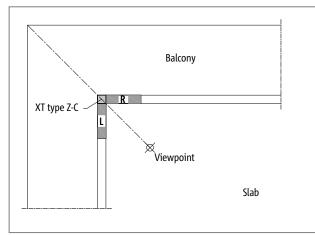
Schöck Isokorb® XT type C: Arrangement XT type C-L left from viewpoint, arrangement XT type C-R right from viewpoint
